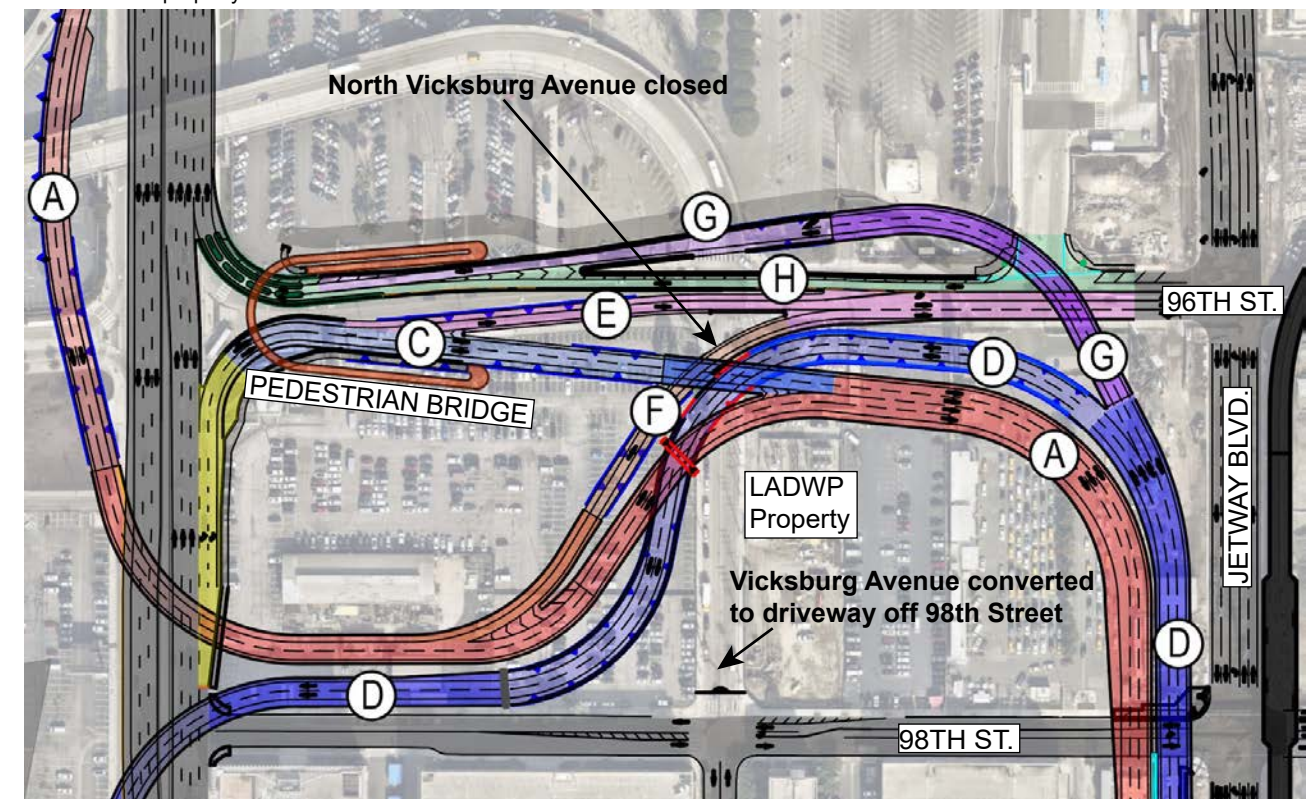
Through access on Vicksburg Avenue between 96th Street and 98th Street would be eliminated; the connection between Vicksburg Avenue and 96th Street would be removed and the remaining southern section of Vicksburg Avenue would be converted to a driveway for LADWP property. The driveway entrance would be from 98th Street.
